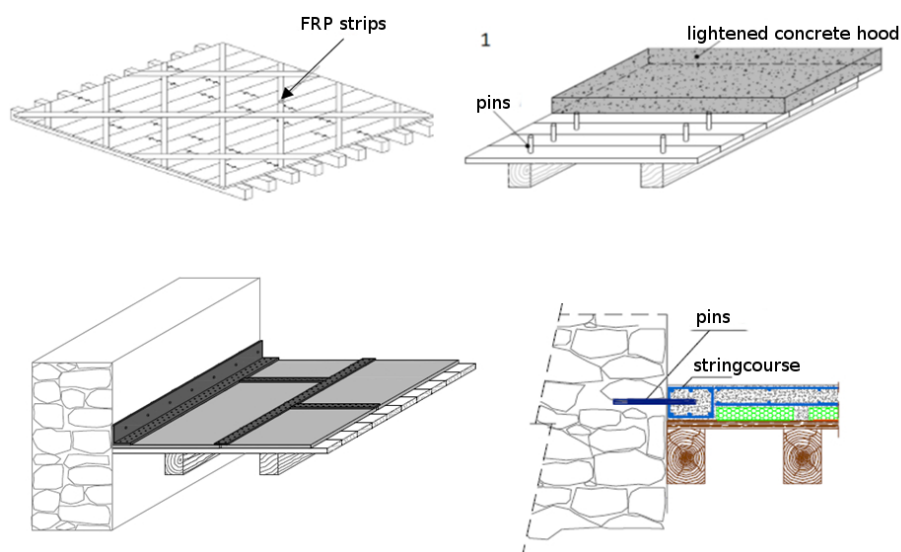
Examples of reinforcement solutions for timber floors with diaphragm function. Timber floor with diaphragm function: connection to the walls; reinforcement with lateral steel beam riveted to the panel and to the wall.
